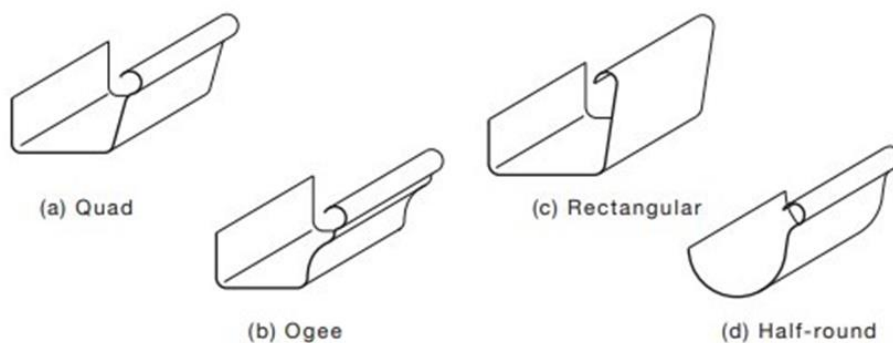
(A) TYPICAL EXTERNAL EAVES GUTTERS
